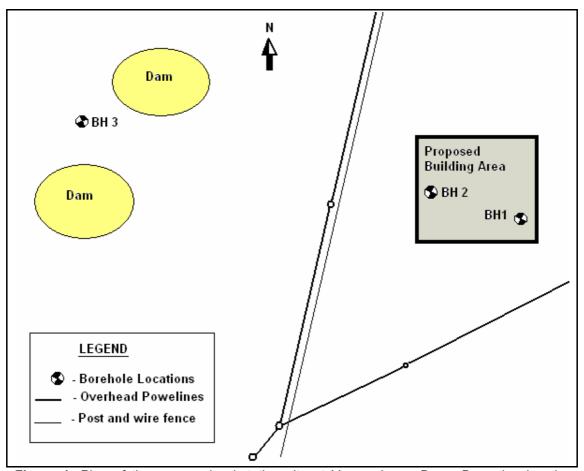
Plan of the proposed substation site at Yagers Lane, Byron Bay, showing the borehole locations.
